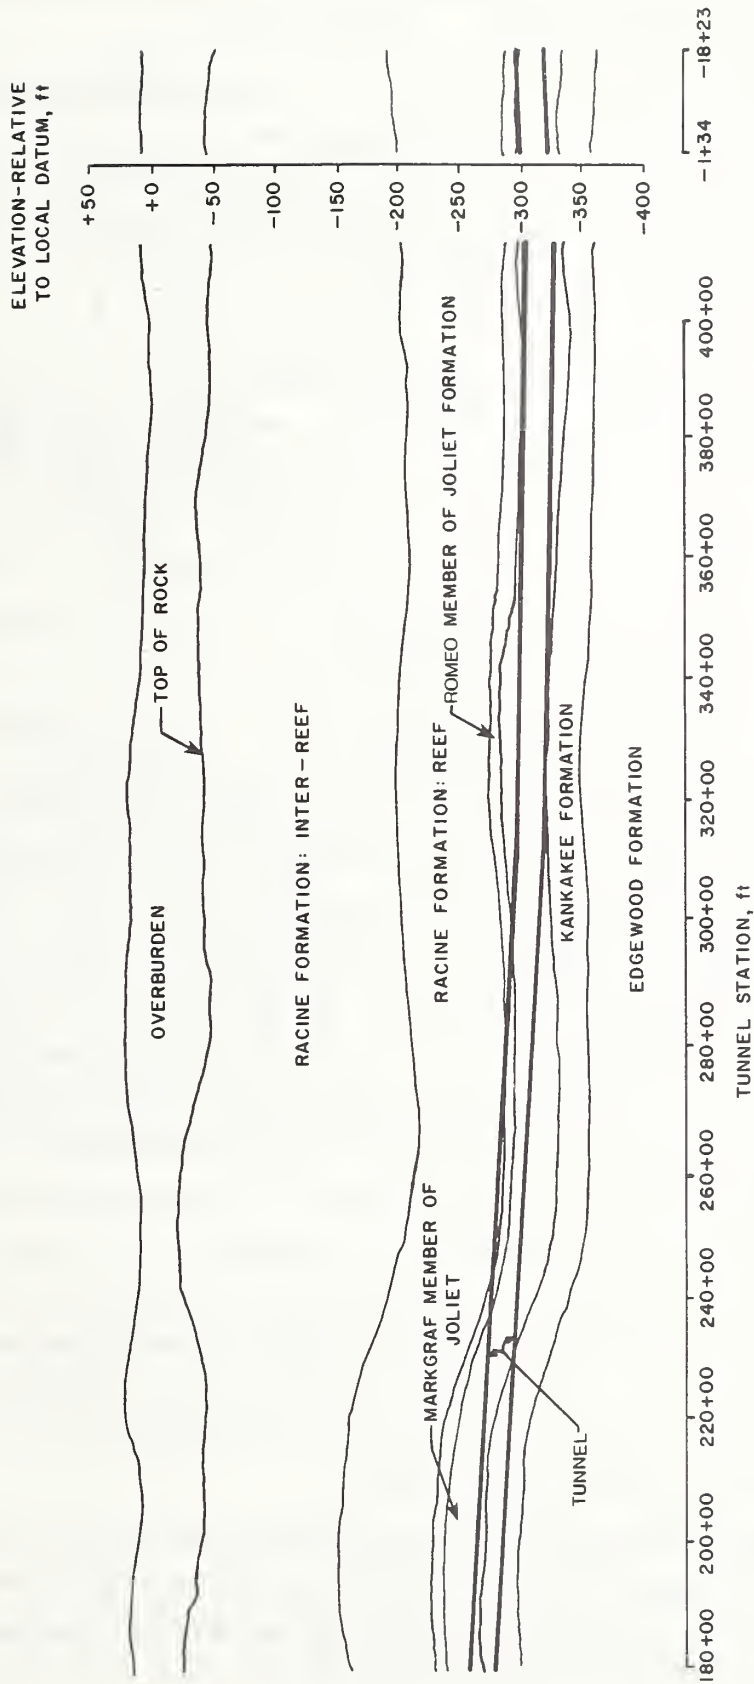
GEOLOGIC PROFILE FOR THE EAST HEADING AND 125th STREET BRANCH TUNNEL OF TARP CONTRACT 73-287-2H
